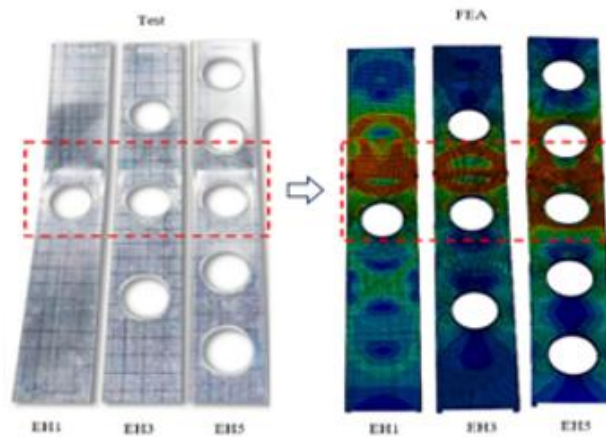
5. Failure modes of unstiffened and edge-stiffened CFS sections with circular web openings under axial compression as reported by Chandramohan et al. [1].
